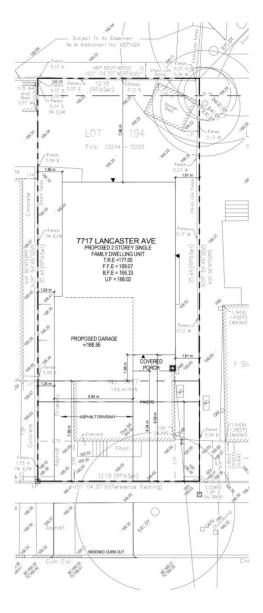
Detail from Proposed Site Plan A-002. (Image: Khalsa Design)
